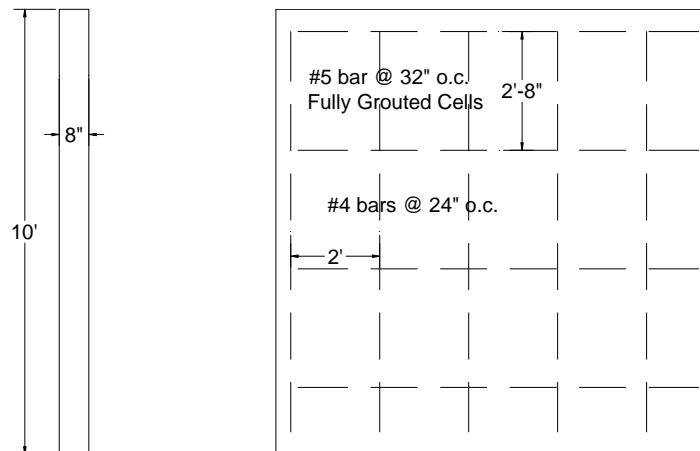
Wall Example In Plane and Out of Plane Shear
